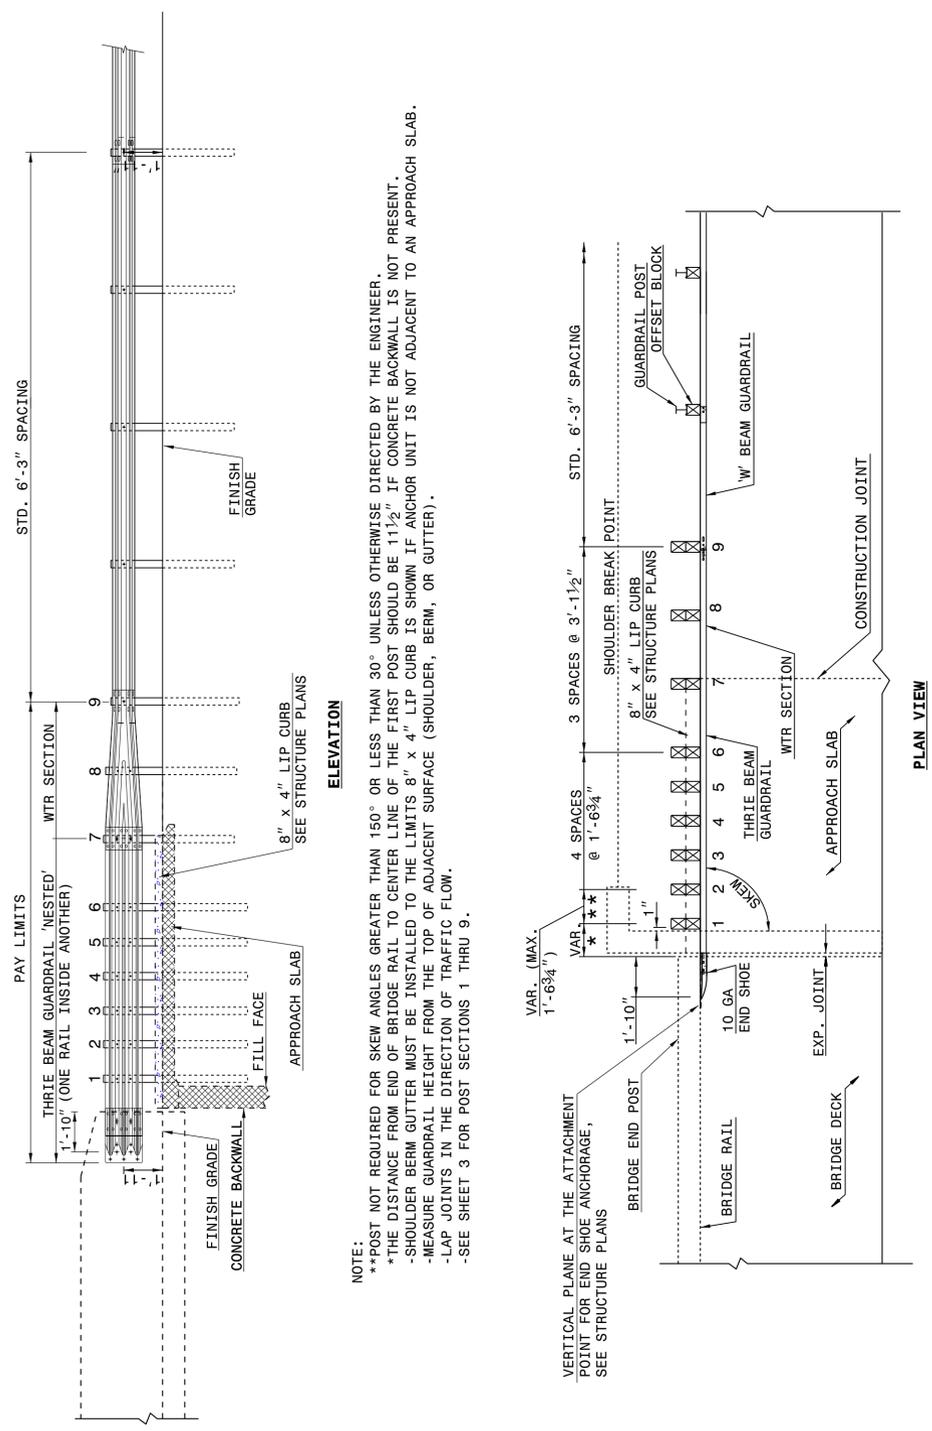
DETAIL SHOWING GUARDRAIL WITH SHOULDER BERM GUTTER
